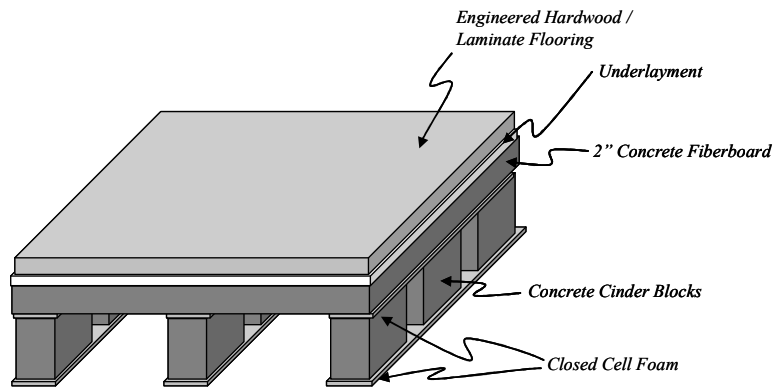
(a): Laminate and engineered hardwood flooring / underlayment / concrete subfloor / floating installation (Sample 1-22).
